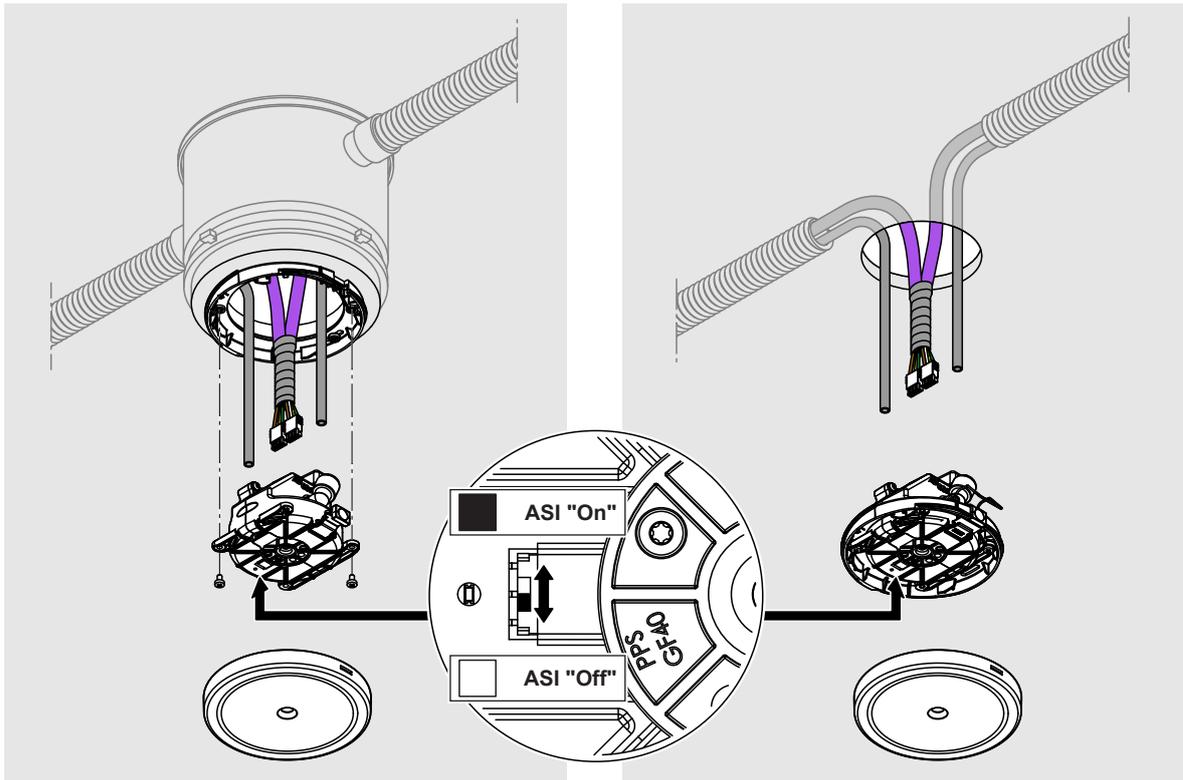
Replacing the spray head (screwed spray head version on the left, pluggable spray head version on the right)
